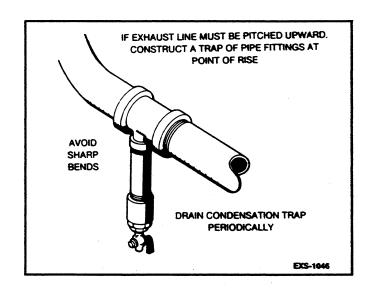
EXHAUST CONDENSATION TRAP
